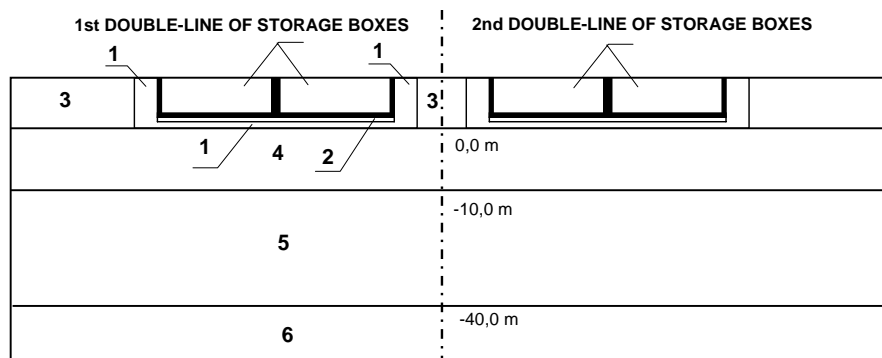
Typical longitudinal section of the 1st double-line of storage boxes in RRWD
